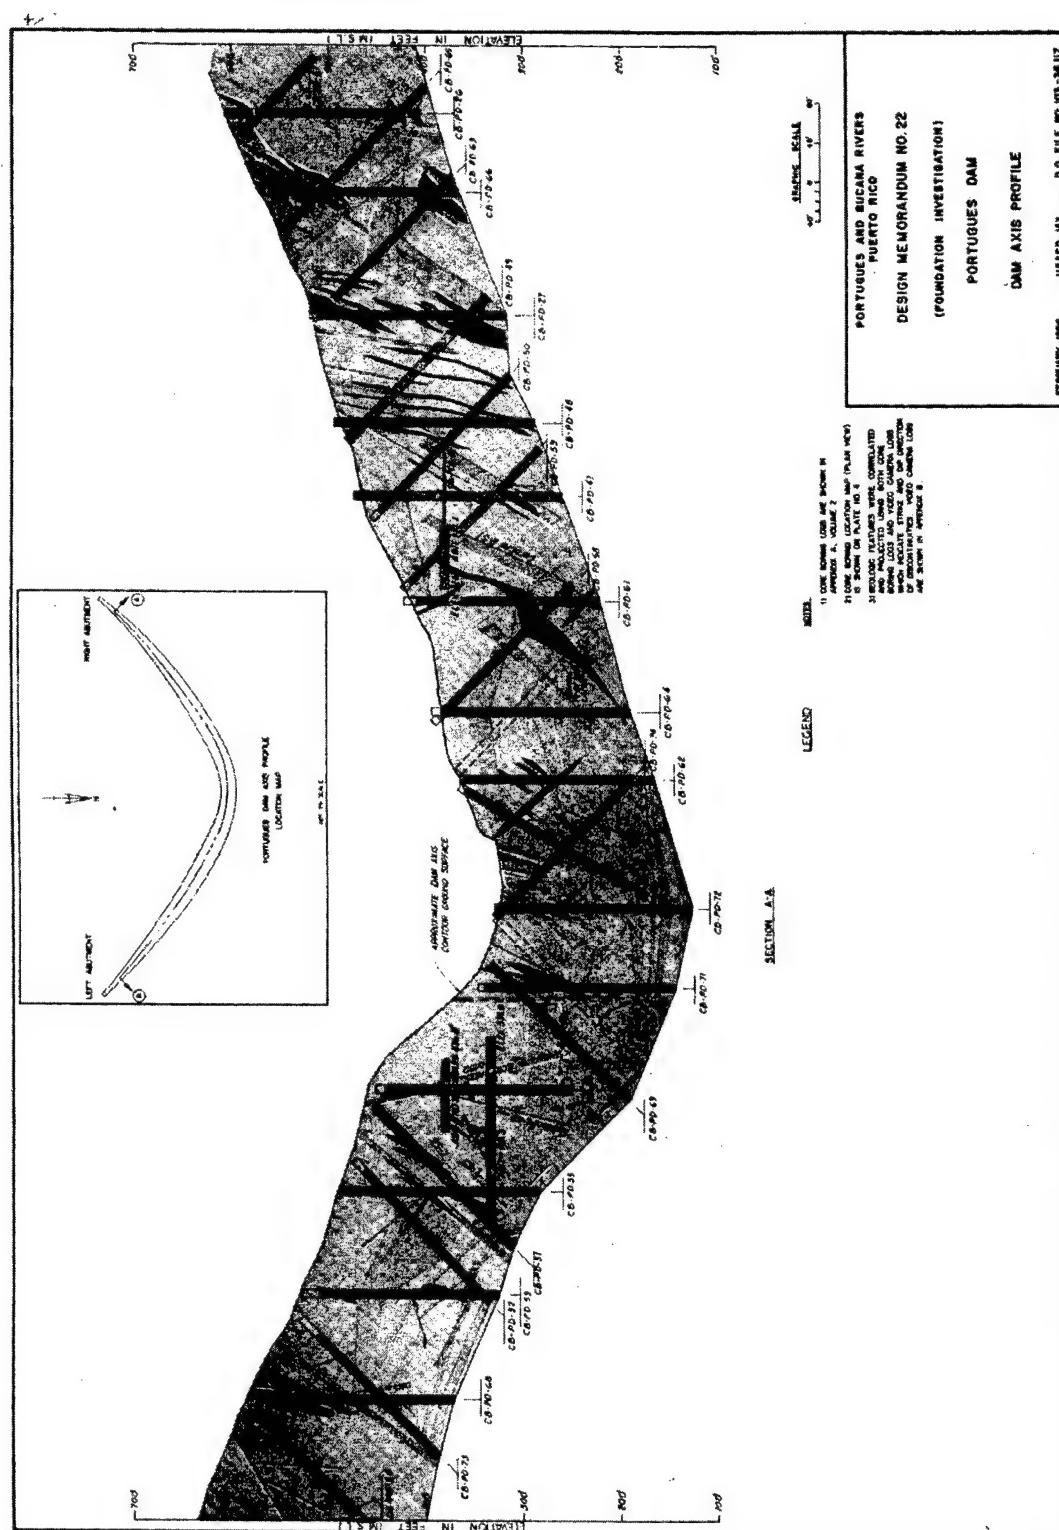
Arch dam boring layout plan from Portugues Dam Design Memorandum No. 22
